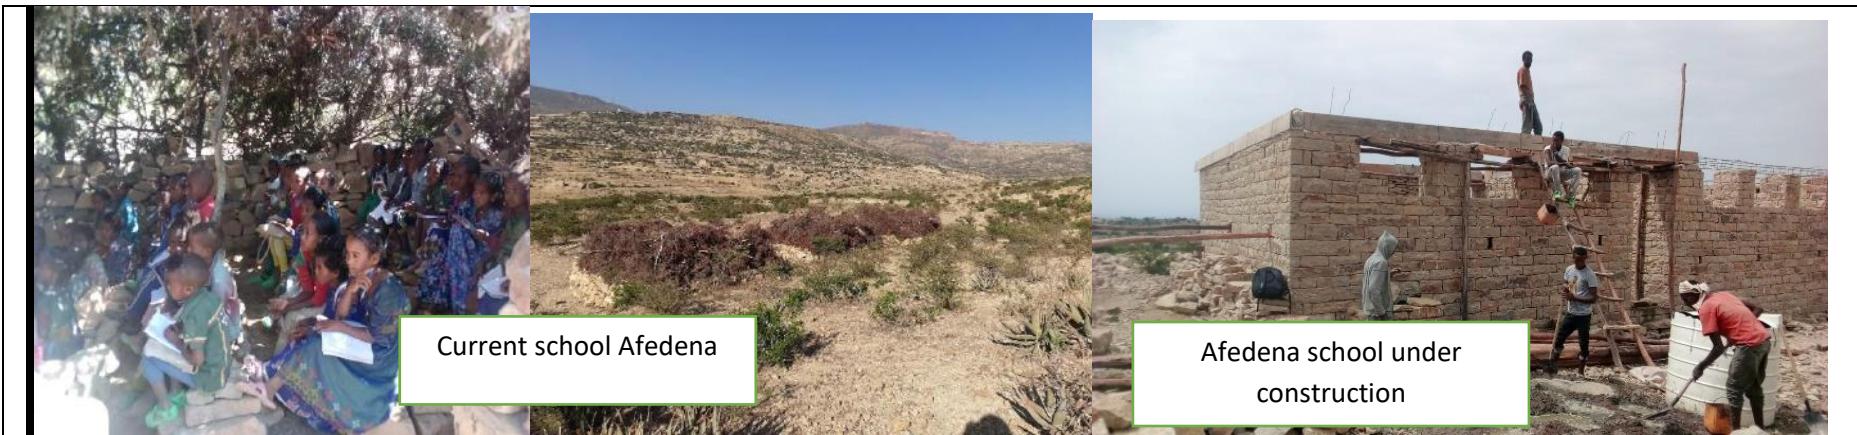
(a-c): New school of Afedena constructed with Plan Vivo funds (fixed walls) and current school (built with branches)
